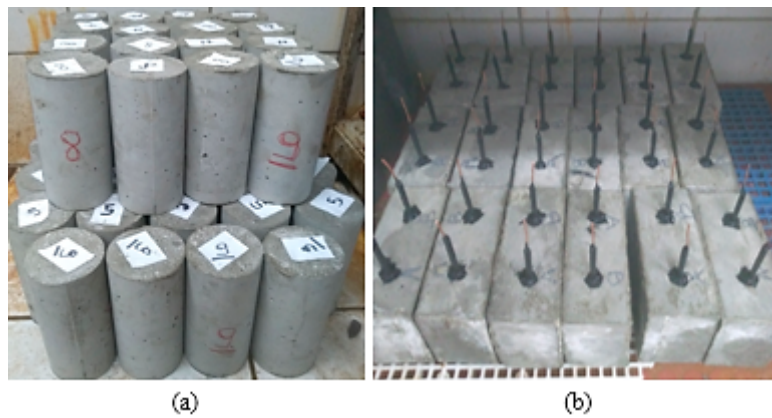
Cylindrical Specimens (a) and Prismatic Specimens (b): Stored in a Moist Curing Chamber
